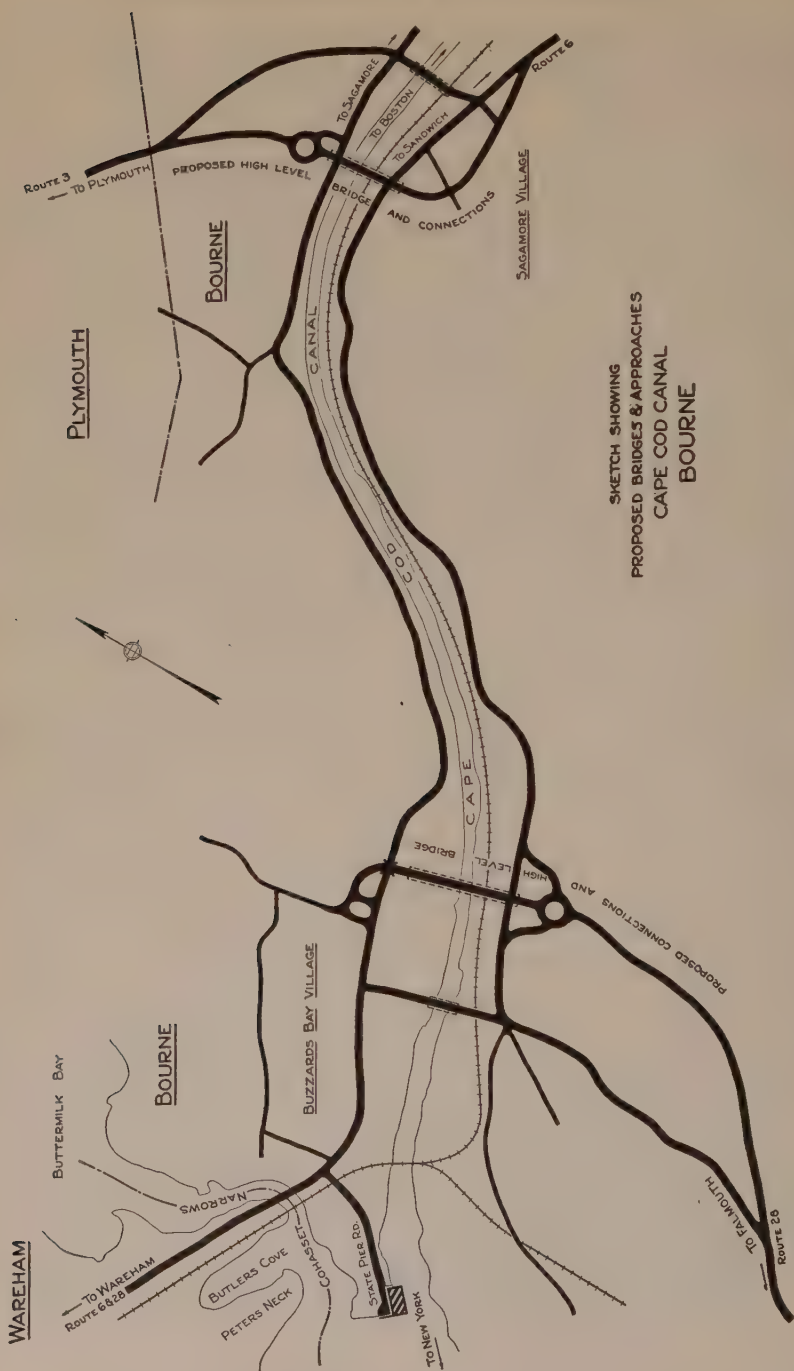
NEW HIGHWAY BRIDGES AND CONNECTIONS TO EXISTING HIGHWAYS
